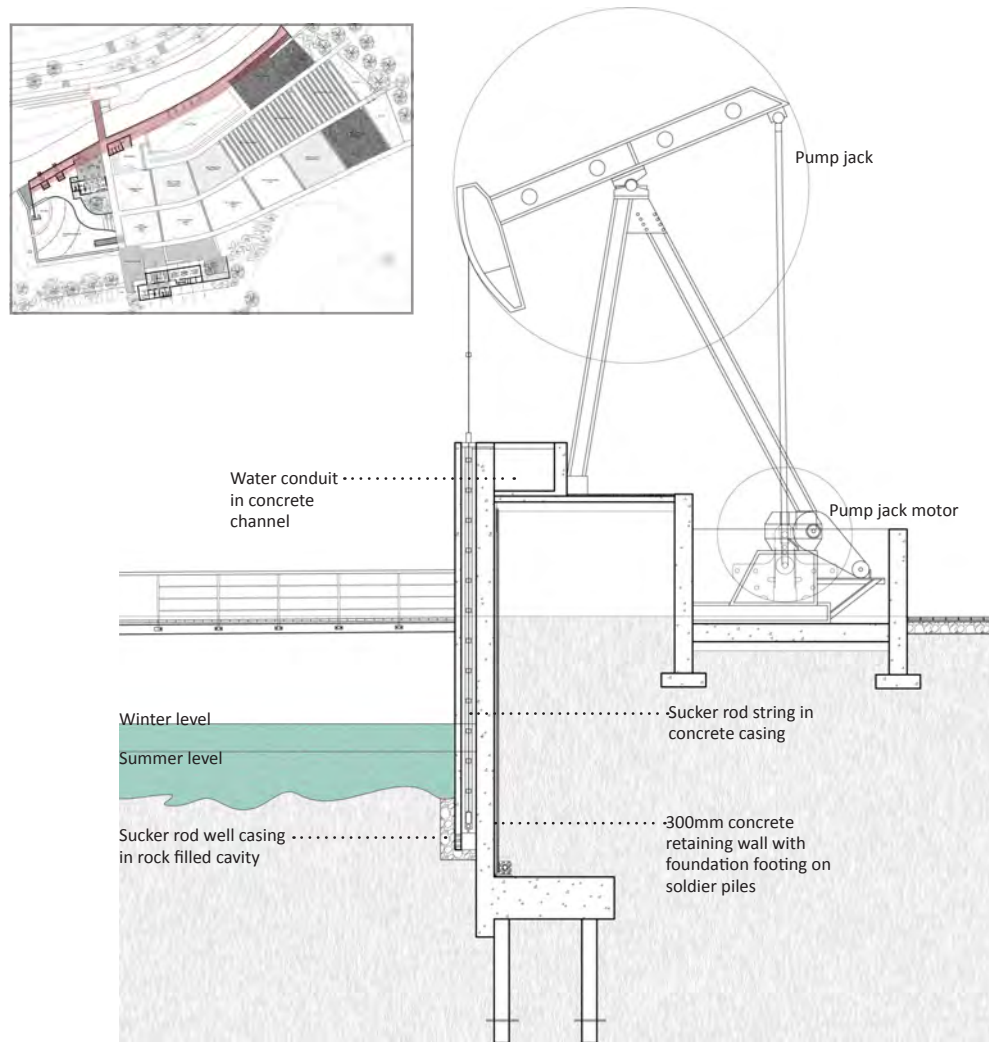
Retaining walls are an important part of the design. The above detail explores the river-facing retaining wall. It was decided to have a bold edge at the start of the process, resulting in the shear concrete face. The pump jack size was later decreased. NTS. (Author, 2013)
